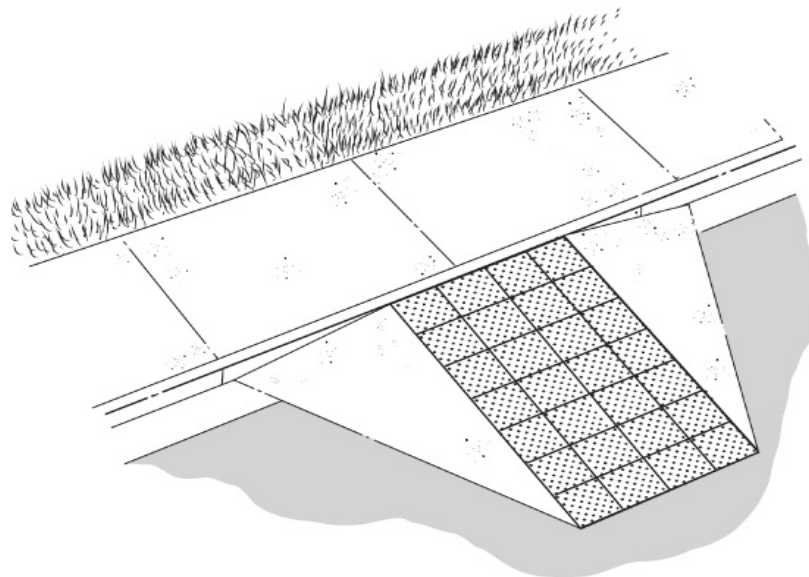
D: Basic built-up curb ramp used to connect the street to the sidewalk safely.
